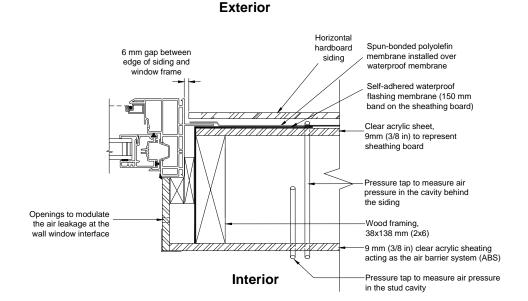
Modified Specimen W4 - V-side (identical to original horizontal section)
